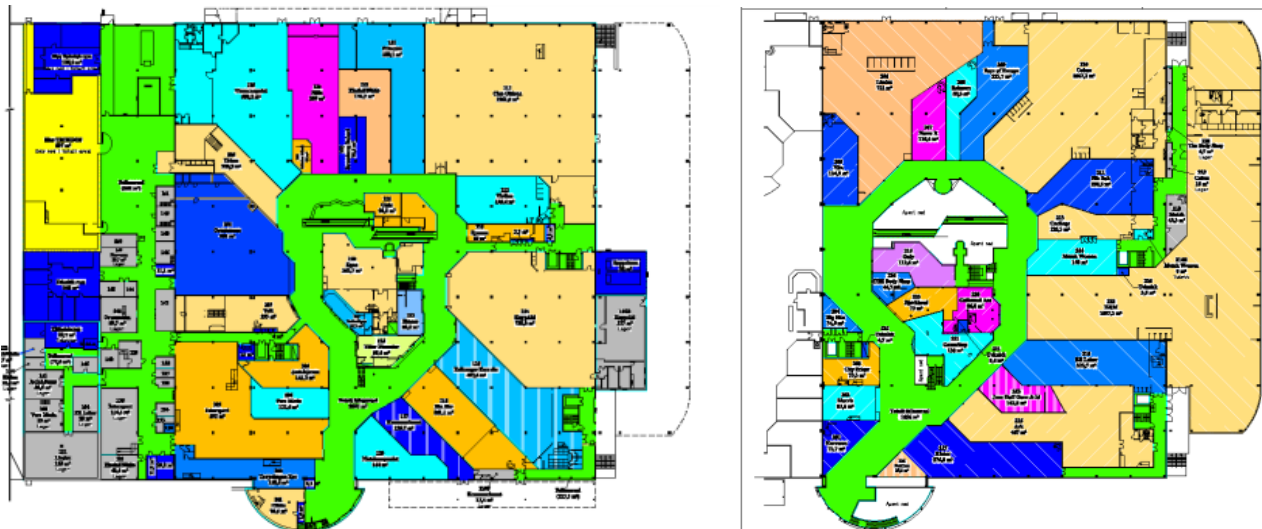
Floor plans Storebrand part, ground floor (left) and first floor (right). Common areas in bright green.
